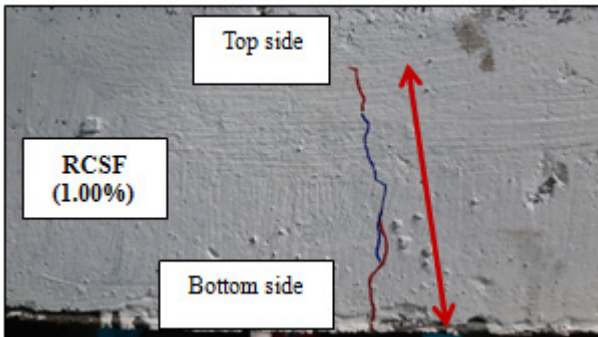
Cracking pattern for steel fibers reinforced concrete slab (1.00%)
